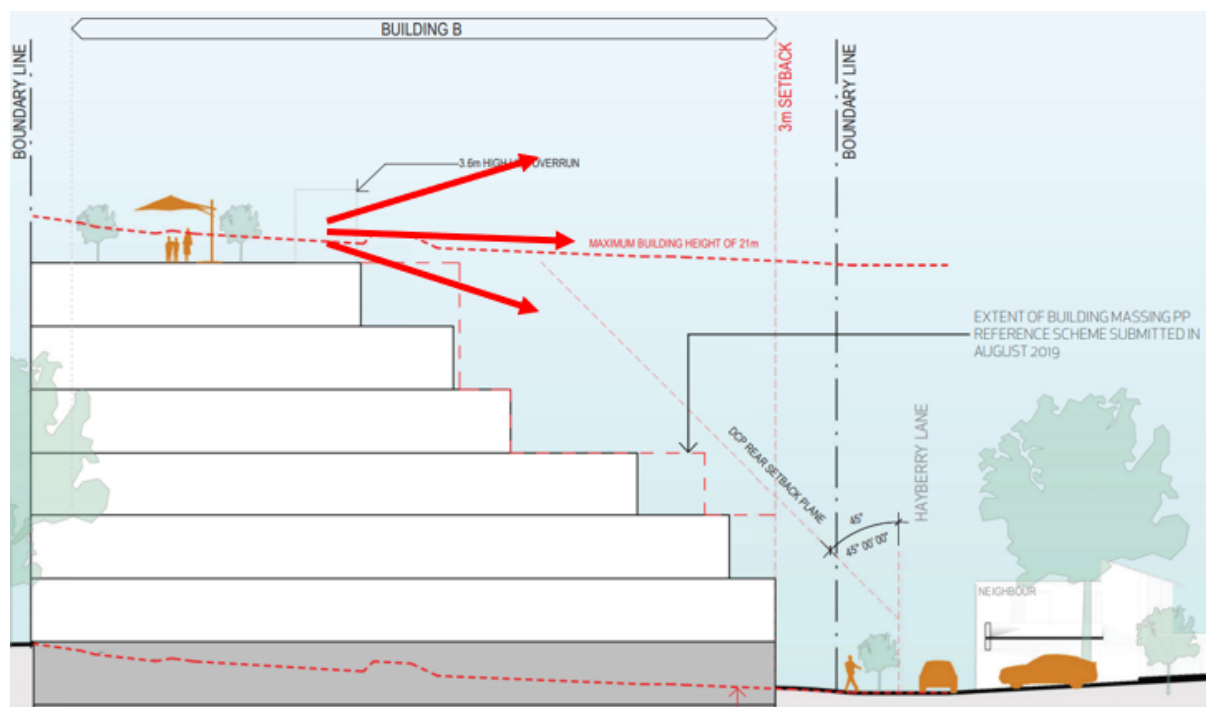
Section showing rooftop areas of proposed building 'B' looking east along Hayberry Lane (red arrows added for view analysis).
